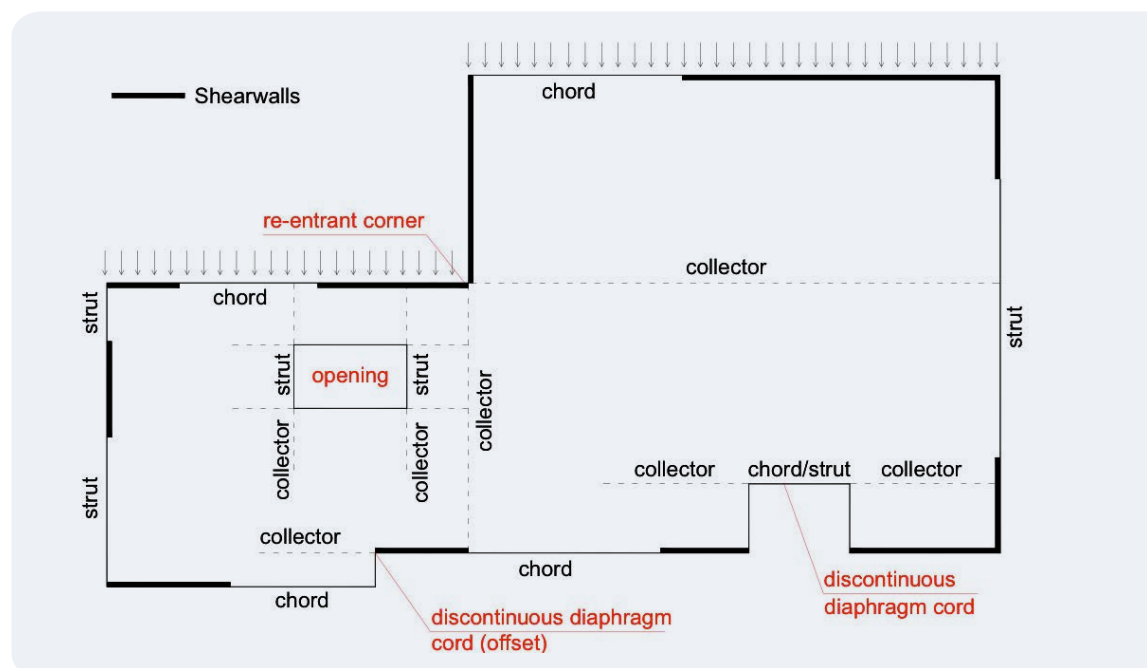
Irregular floor geometry with typical diaphragm elements.
